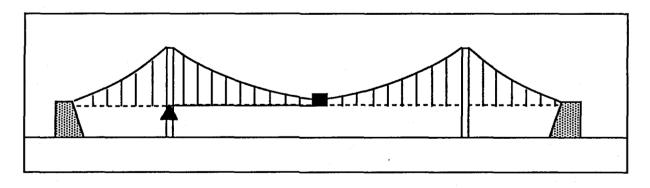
THREE-SPAN SUSPENSION BRIDGE WITH A CENTRAL CLAMP AND A FIXED BEARING ON ONE OF THE PYLONS
